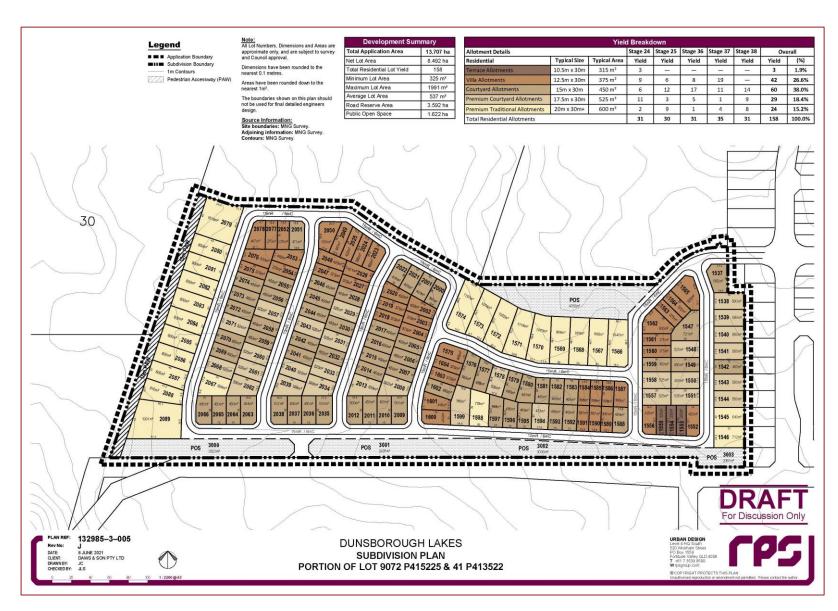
Subdivision Plan for Lots 41 & Lot 9072 Commonage Road, Dunsborough
